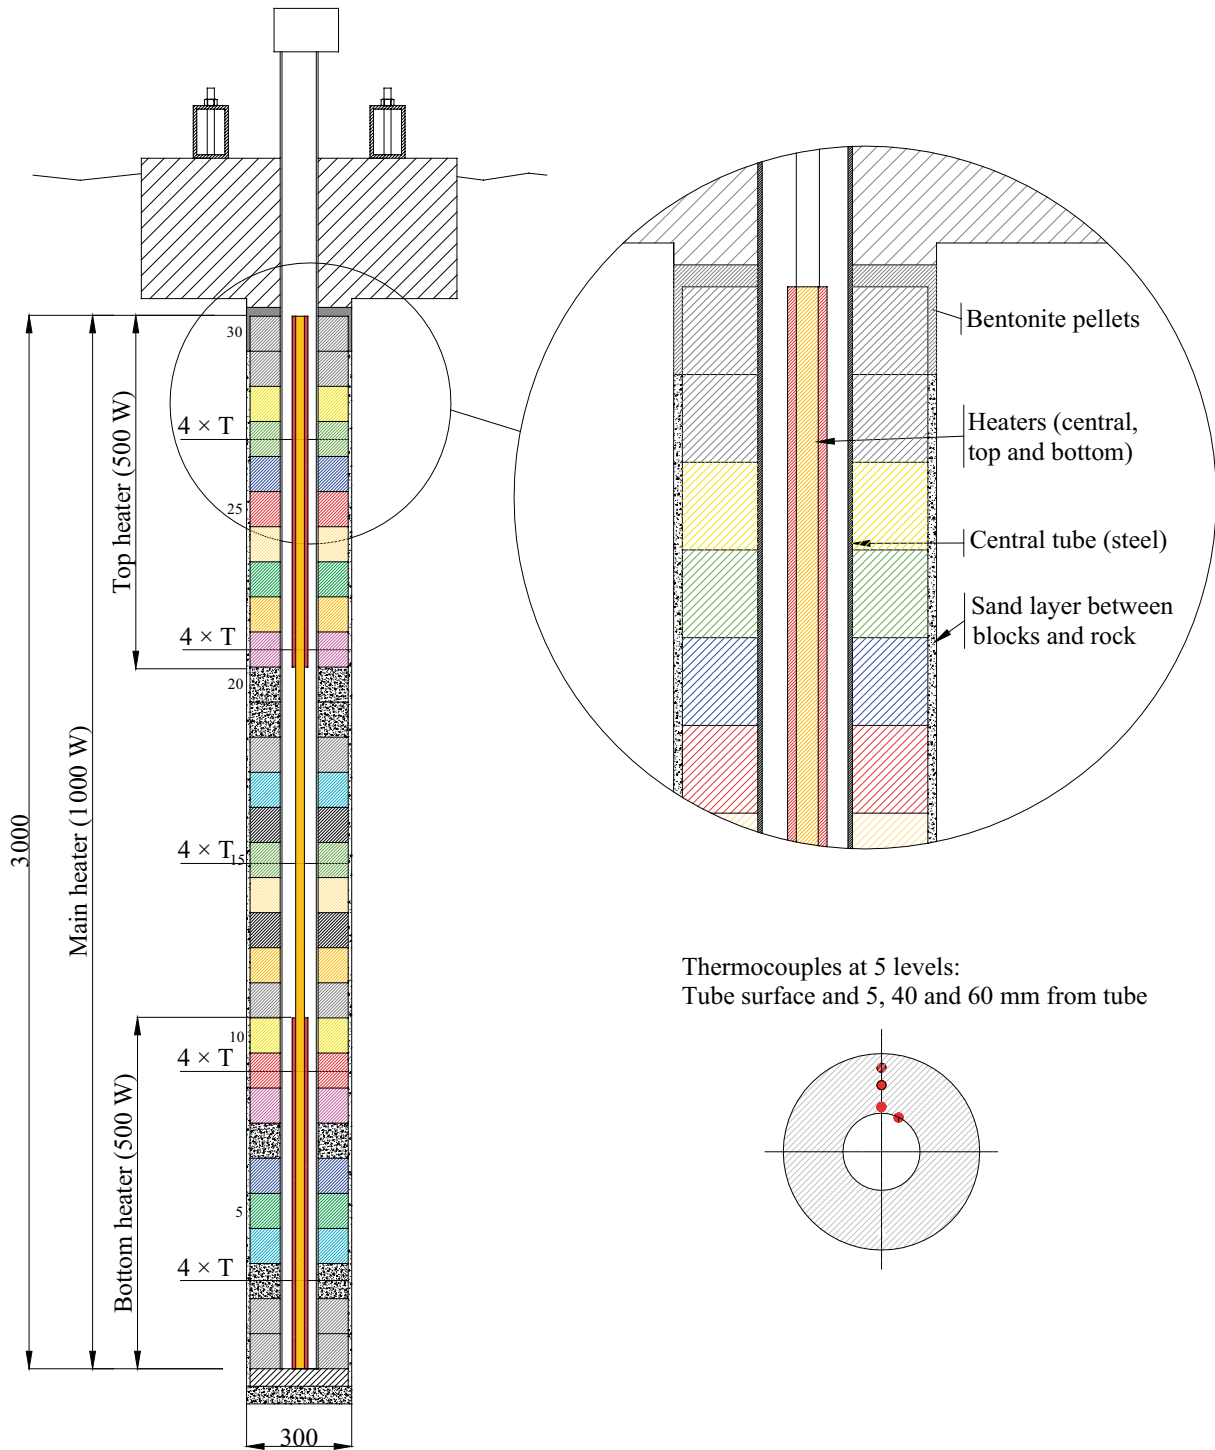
Schematic drawing showing the principal design of the new ABM test packages. On top is a concrete block situated to keep the swelling bentonite blocks in place, reinforced with steel bars on top. The numbers at the blocks indicate block numbers (#).
